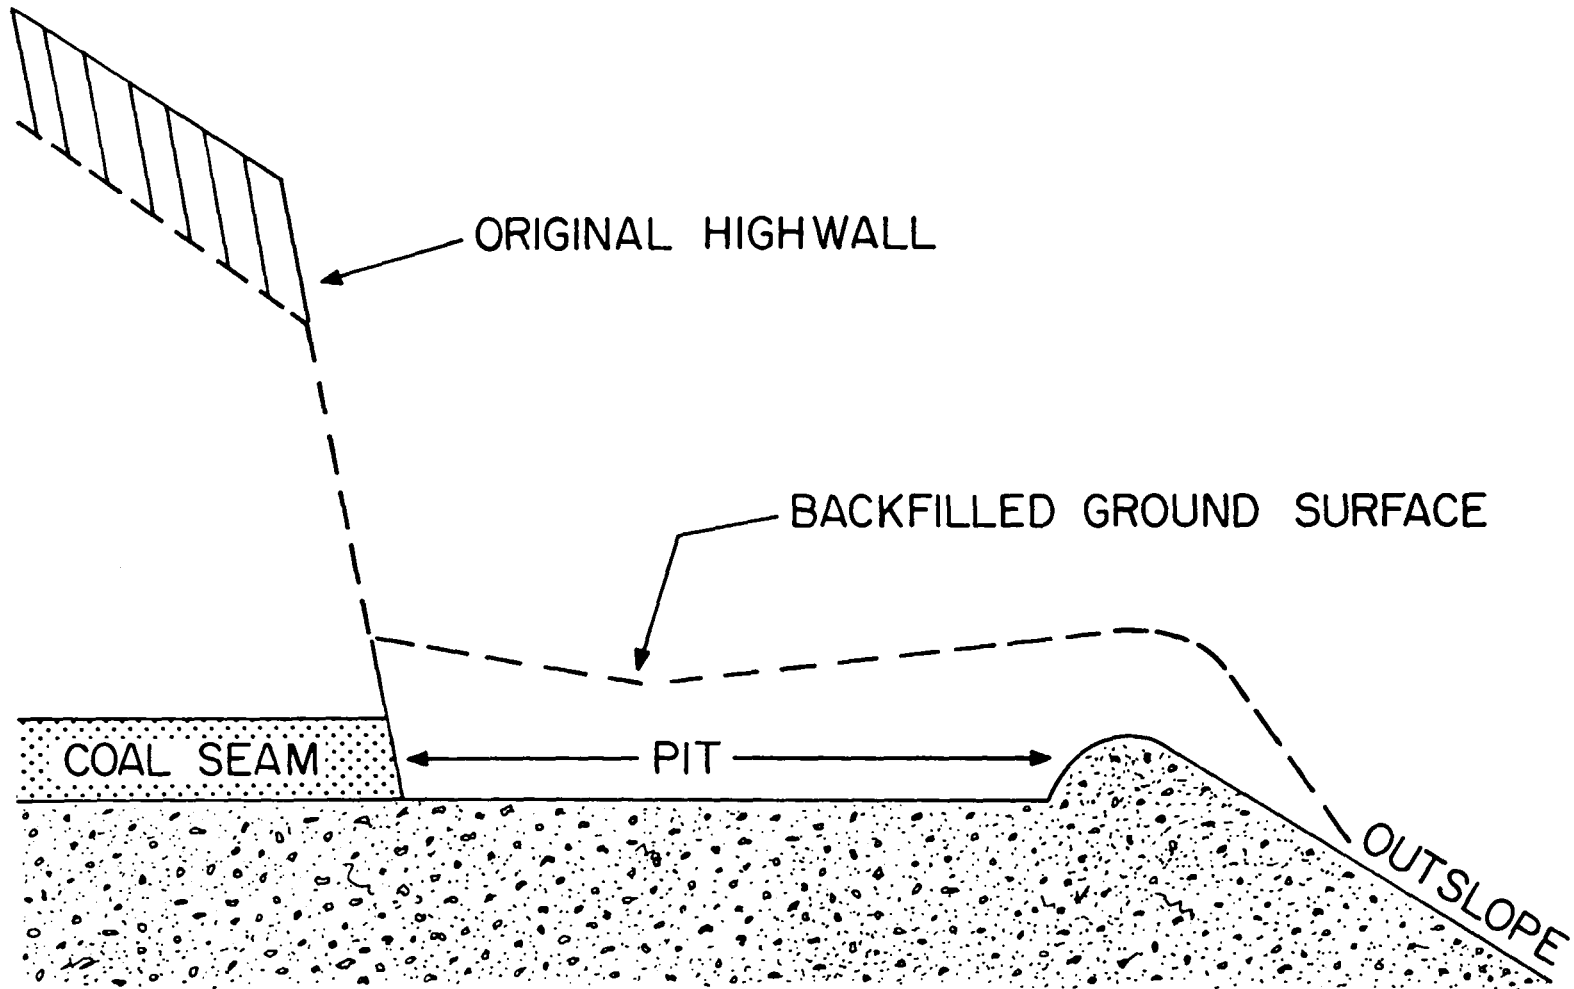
Crosssectional diagram of a backfilled ground surface, angled toward the highwall.
